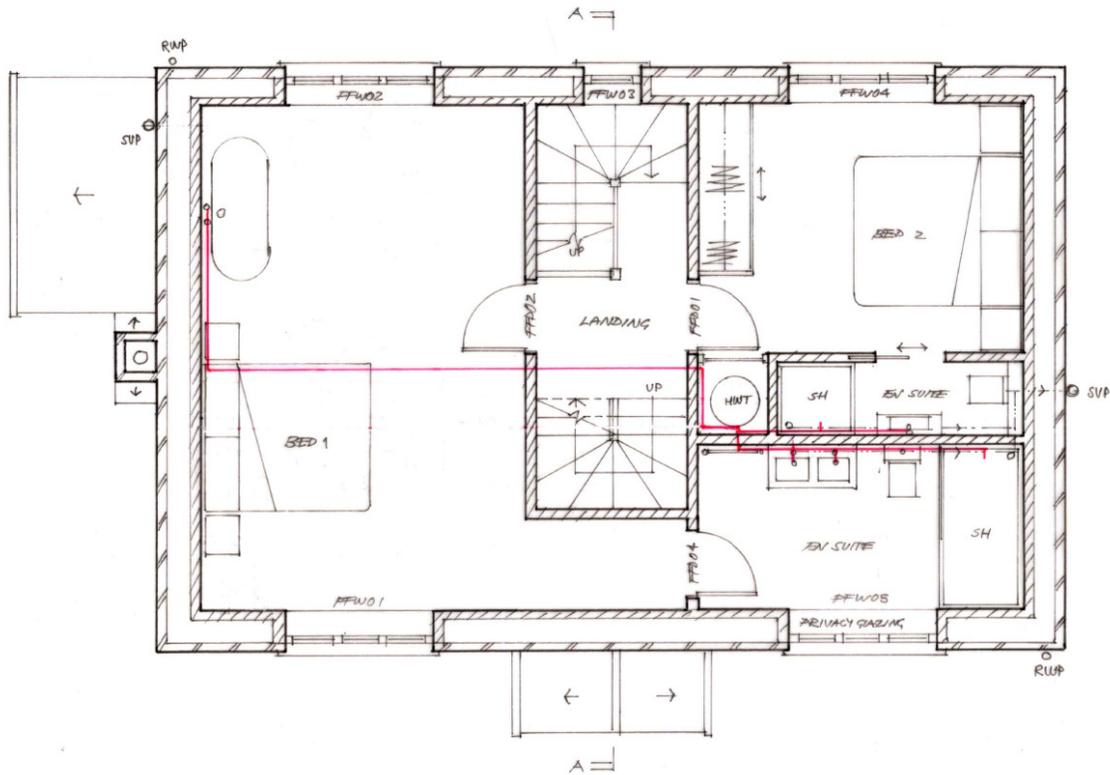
First Floor Plan. Drawing by Lacey Interior Architecture Ltd.
